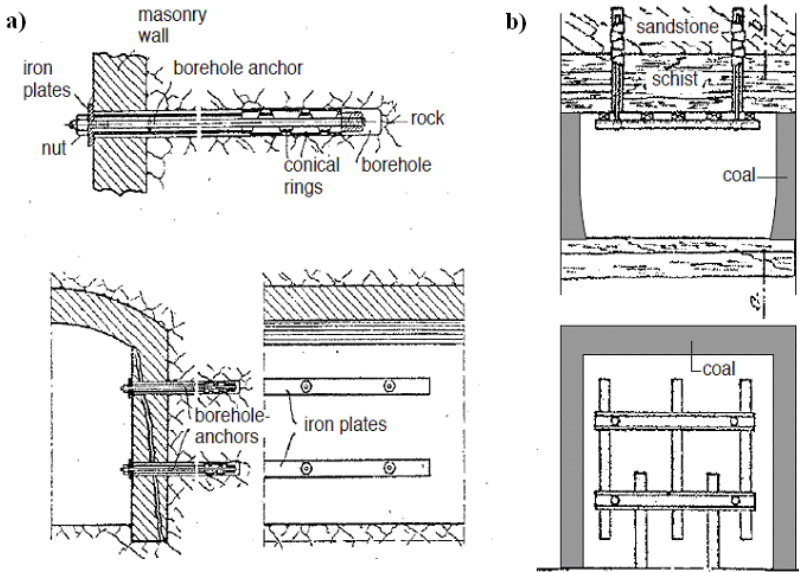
First application of rock bolting support (a) in sidewalls, (b) in the roof of a mine working [18]
